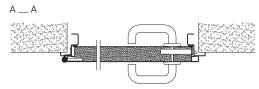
Horizontal cross-section of the ECO BASIC external seamless steel door with a corner frame
